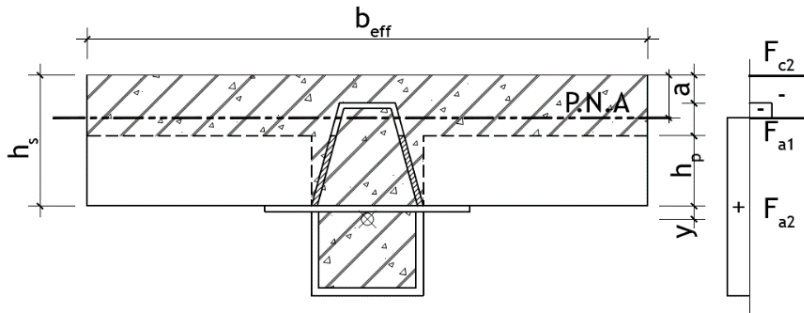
The P.N.A lies within the concrete slab above the deck rib
